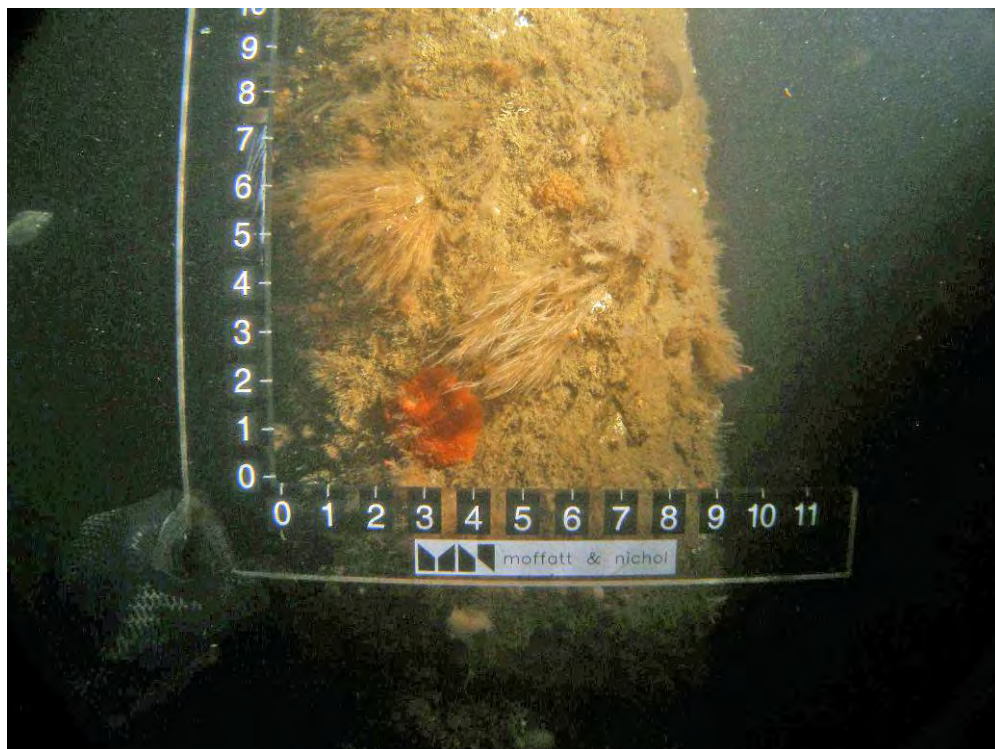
Bent 76, Pile 14 – Portion of pile with no damage
